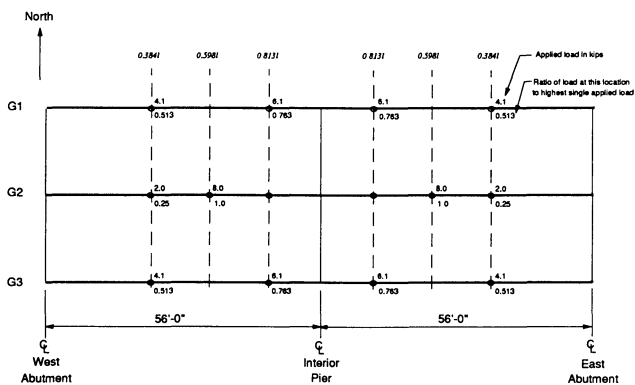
Compensatory Dead Load 2 (DL2) applied to the composite model bridge after deck panels made composite with steel girders.
